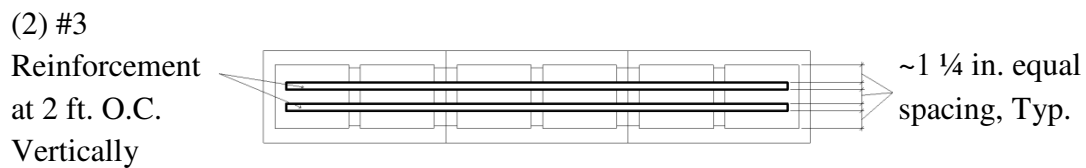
Figure H: Plan View of Horizontal Reinforcement on Bond Beams
